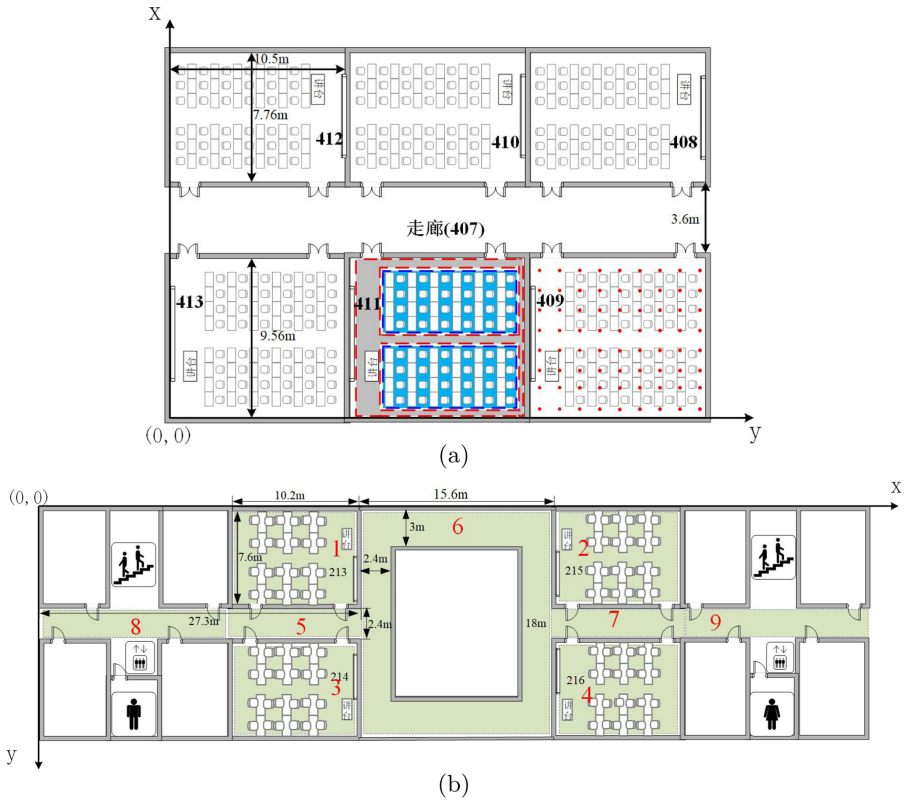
Experimented environment layouts (a) Building D, fourth floor and (b) Building N, second floor.
